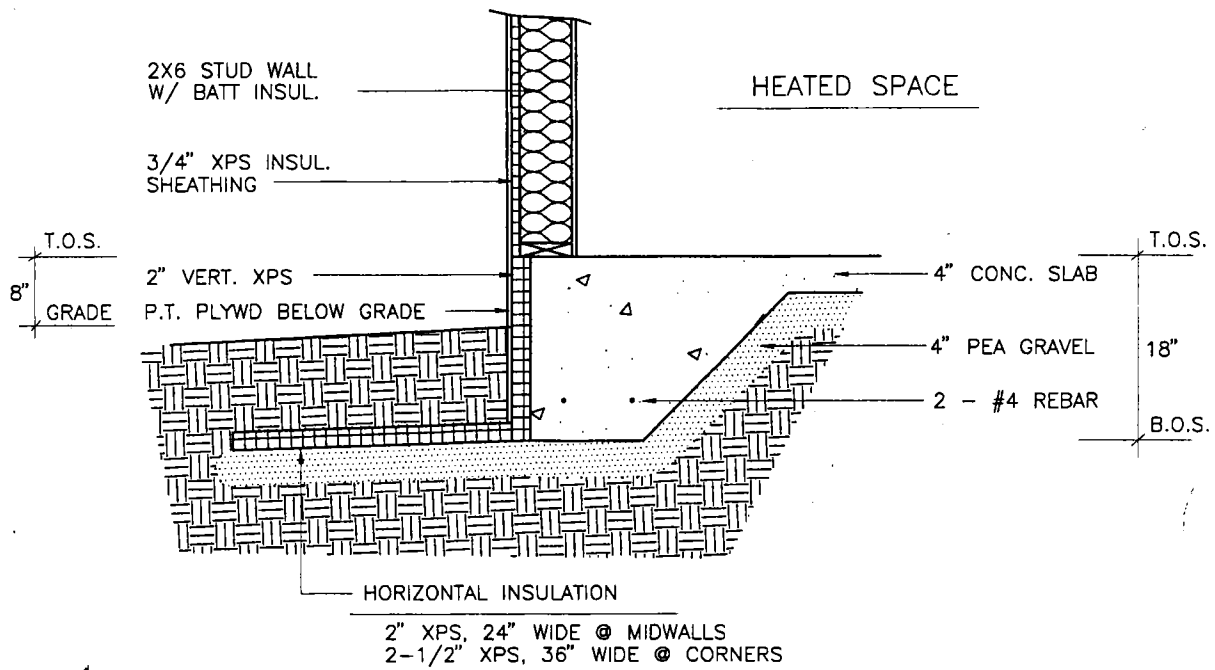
Heated FPSF as-built detail for house #1 in Fargo, ND.
